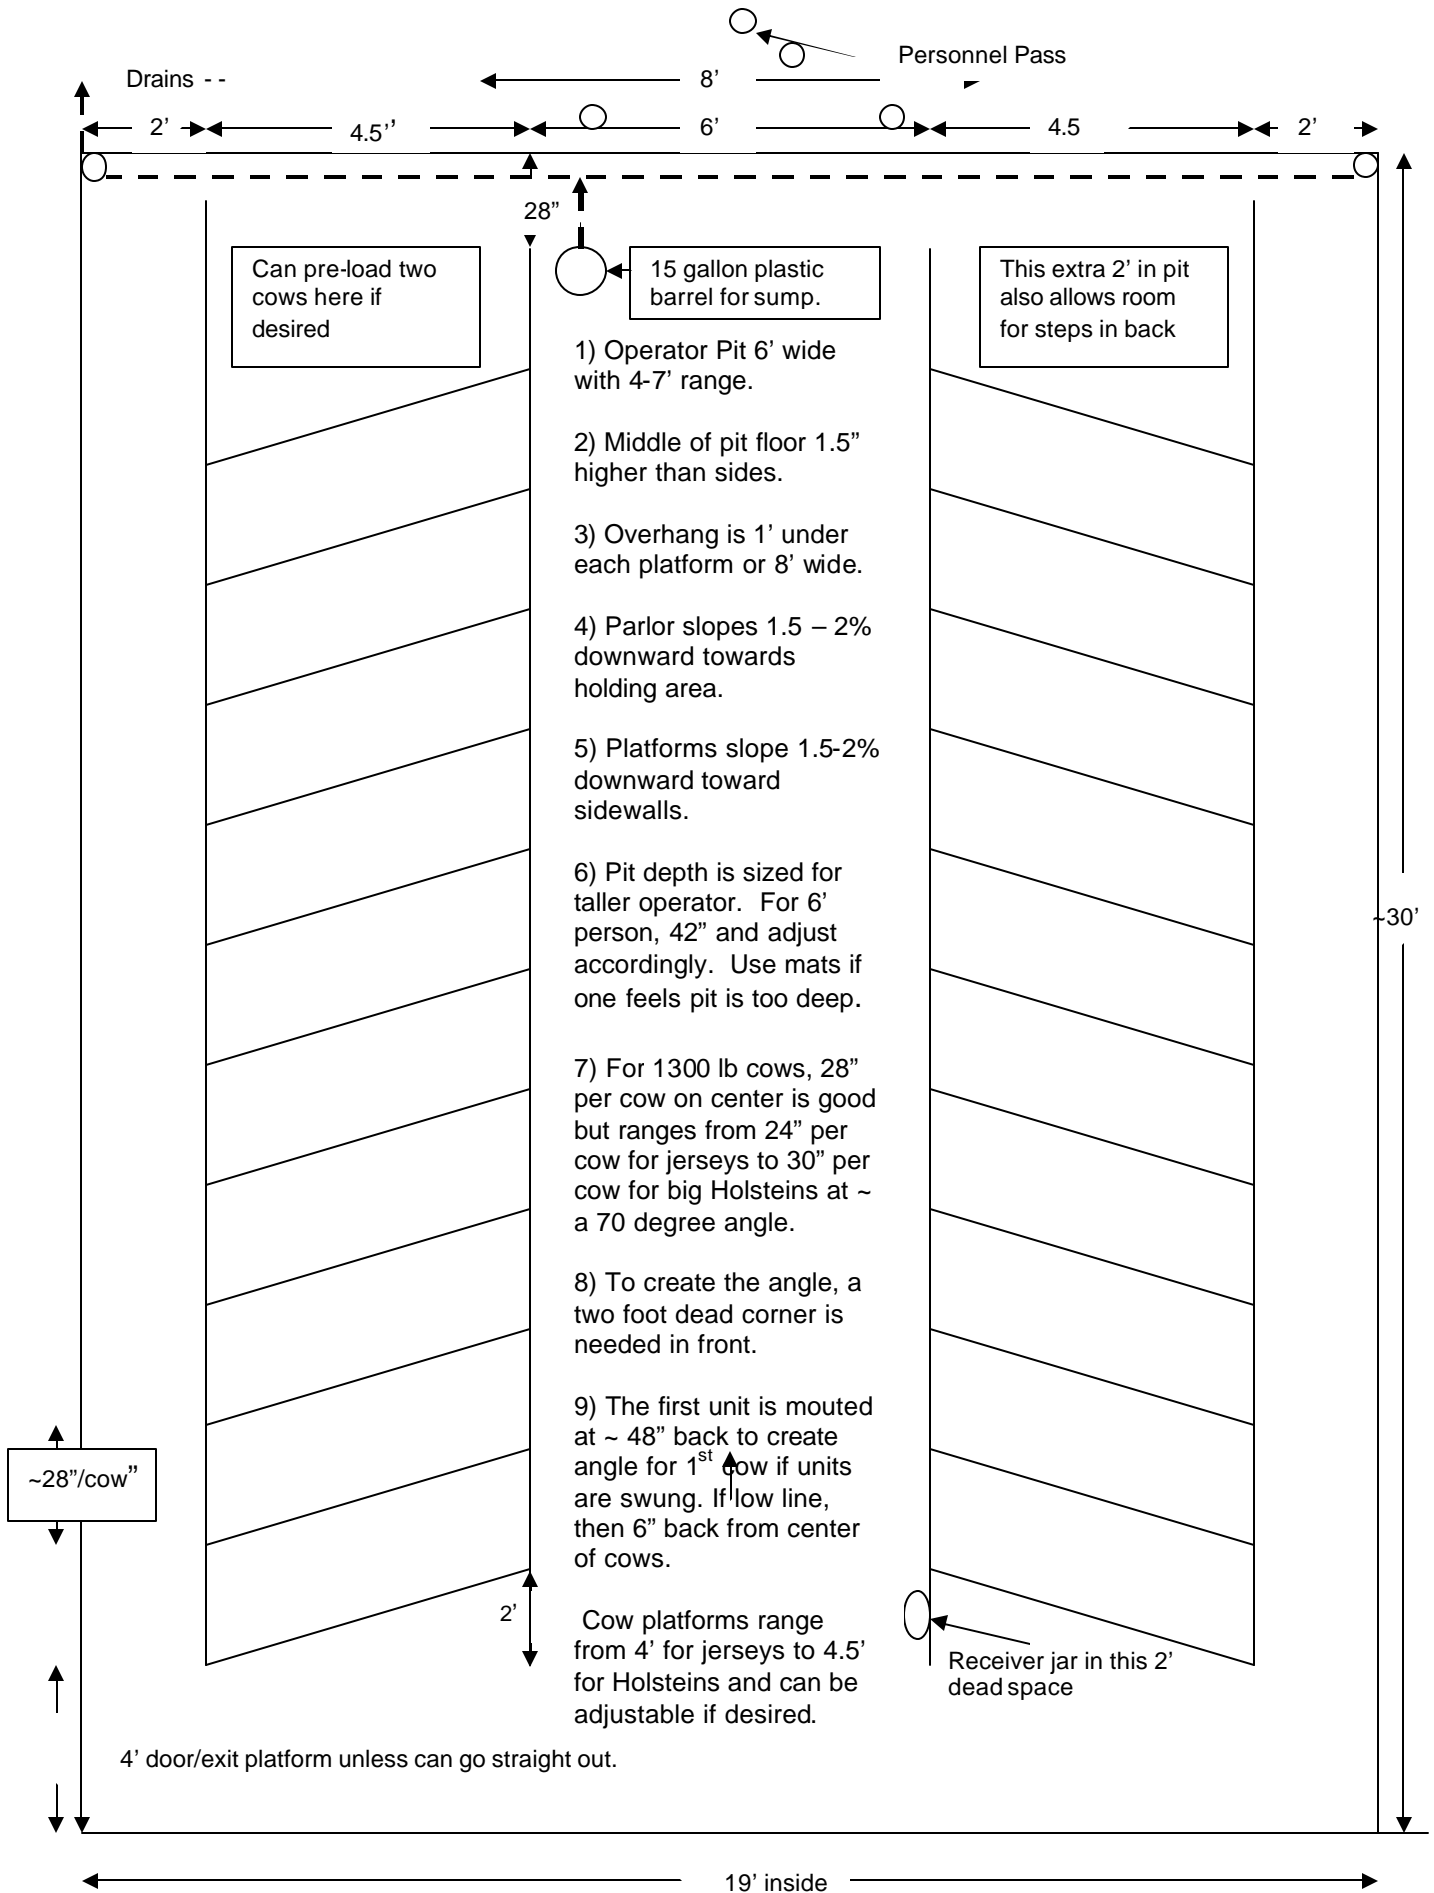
Sample Plan of Swing 10 Milking Parlor—TRANS Iowa Stall Design
